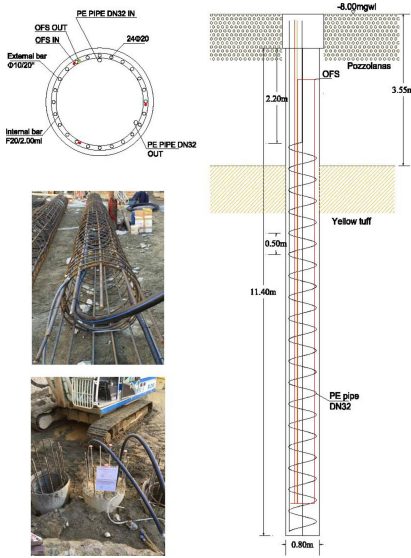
Experimental set up details: typical section of equipped pile; pictures of set-up distribution of OFS cables and spiral probes before and after concrete casting; pile section with geometric and ground features.
